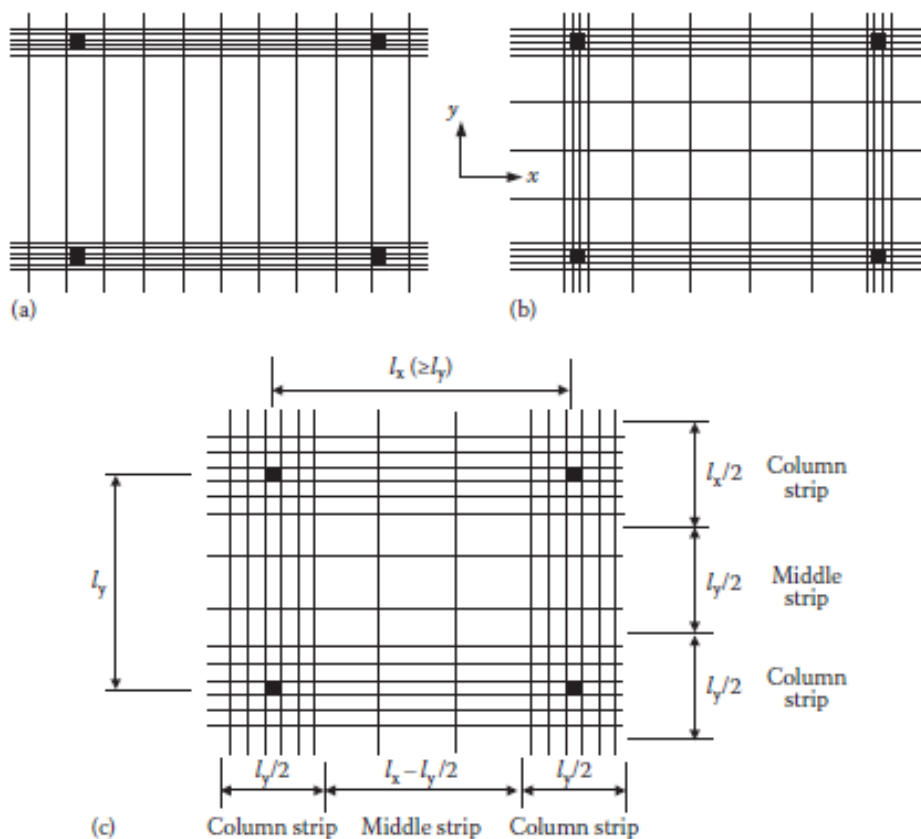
Alternative tendon layouts. (a) One-way slab arrangement. (b) Two-way slab arrangement with column line tendons in narrow band. (c) Two-way slab arrangement with column line tendons distributed over column strip.
